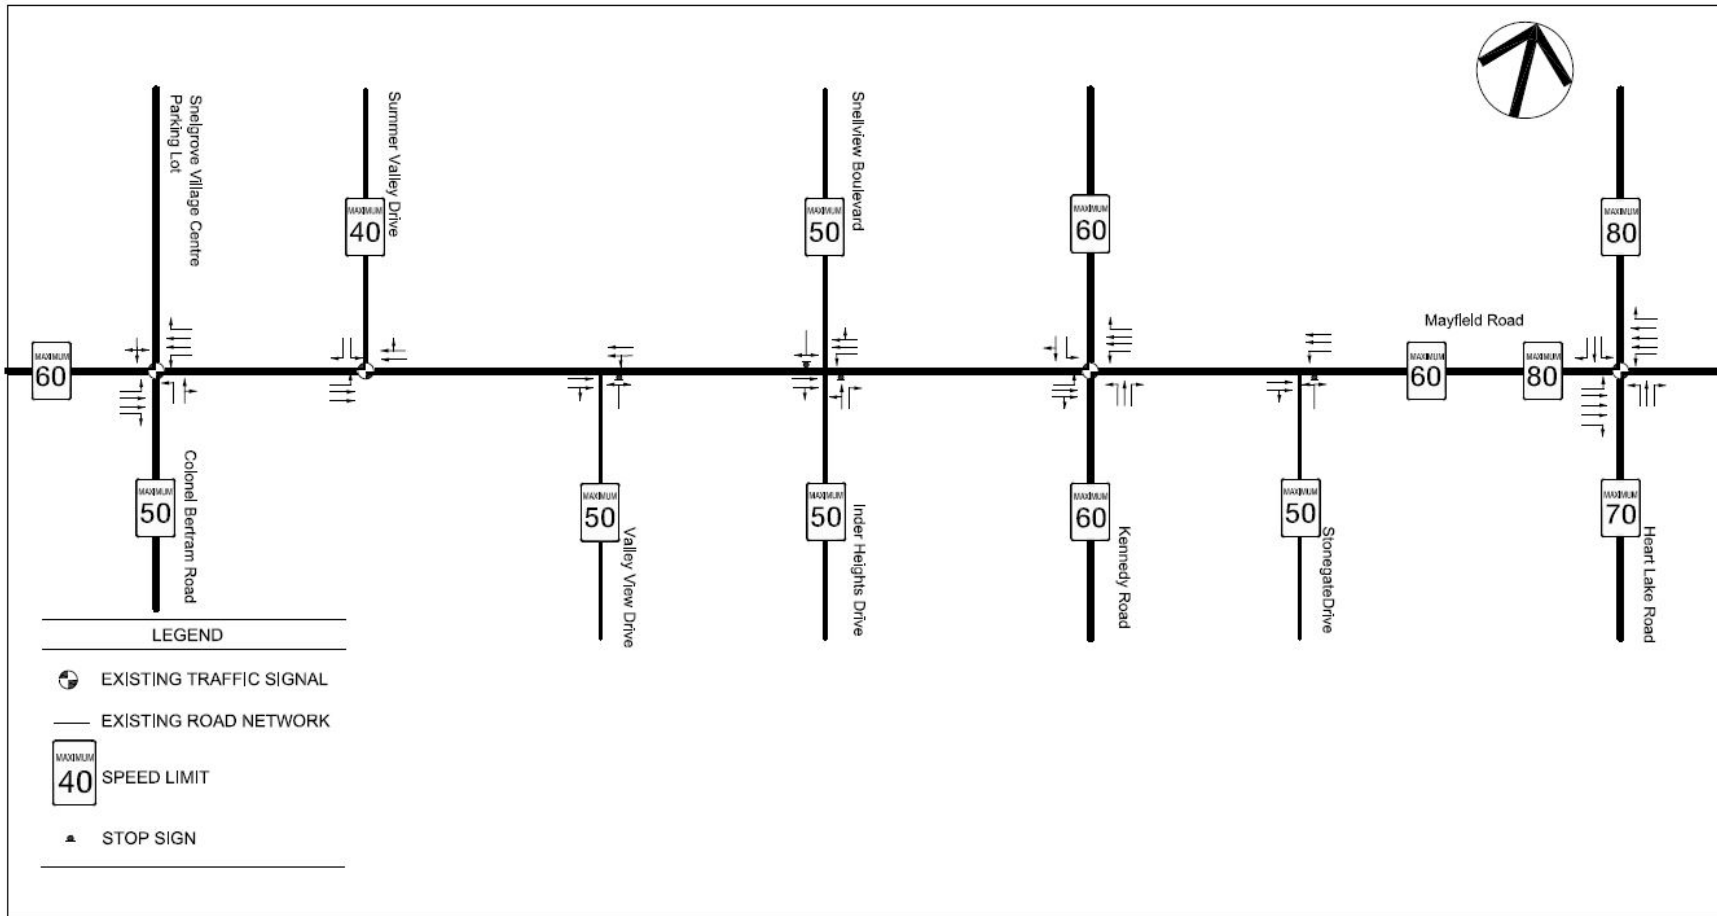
Existing Roadway Lane Configurations east of Hurontario Street
